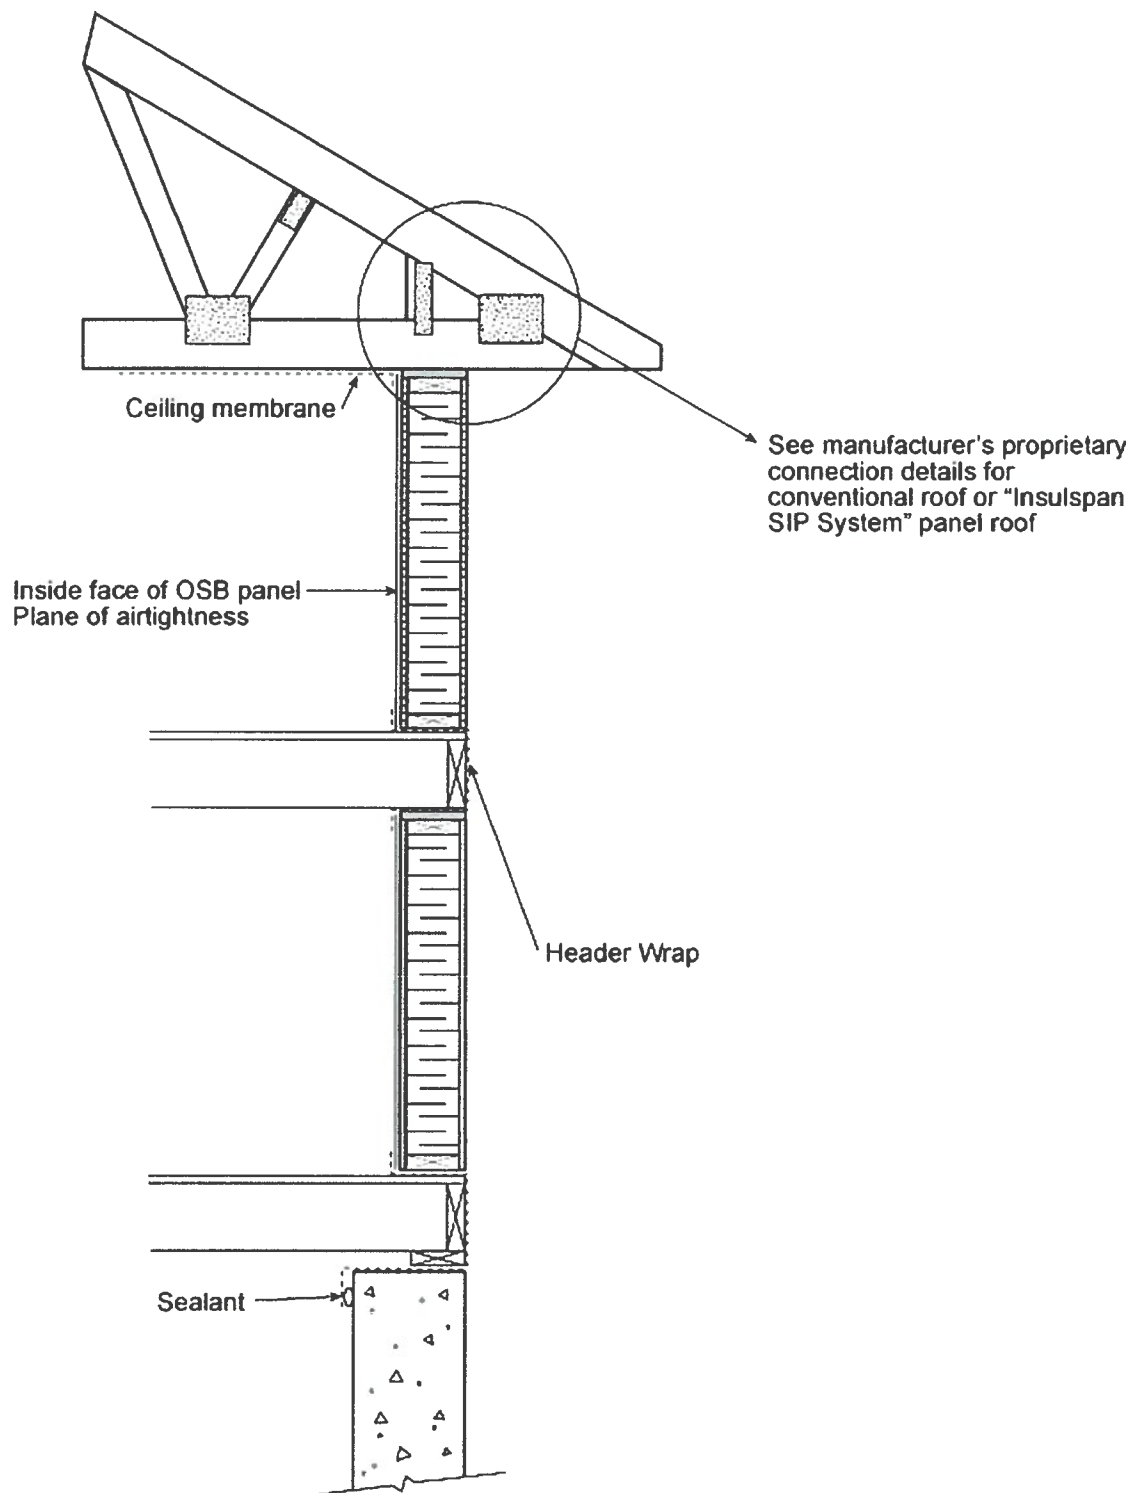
"Insulspan SIP System" – proprietary air barrier system – continuity of seal of the inside barrier face must be maintained.
